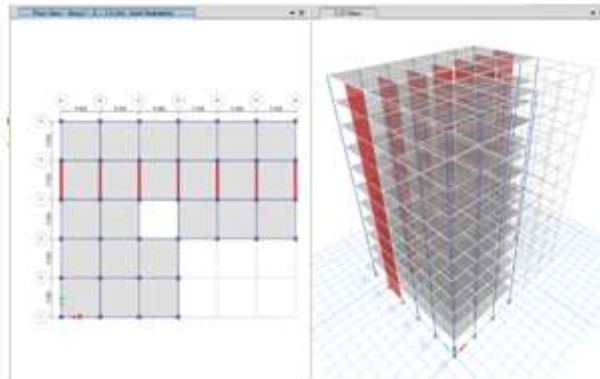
Building frame with shear wall parallel to Y-direction (M4)
